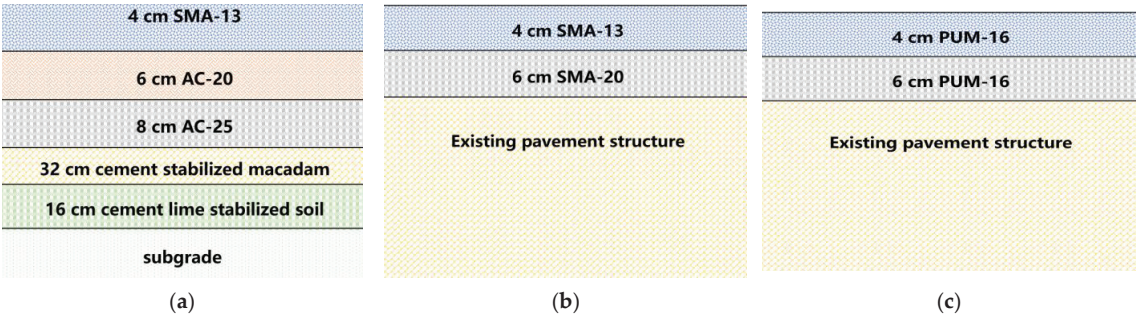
Composite pavement structure. (a) Old pavement structure; (b) Main line pavement structure; (c) Polyurethane mixture pavement structure.
